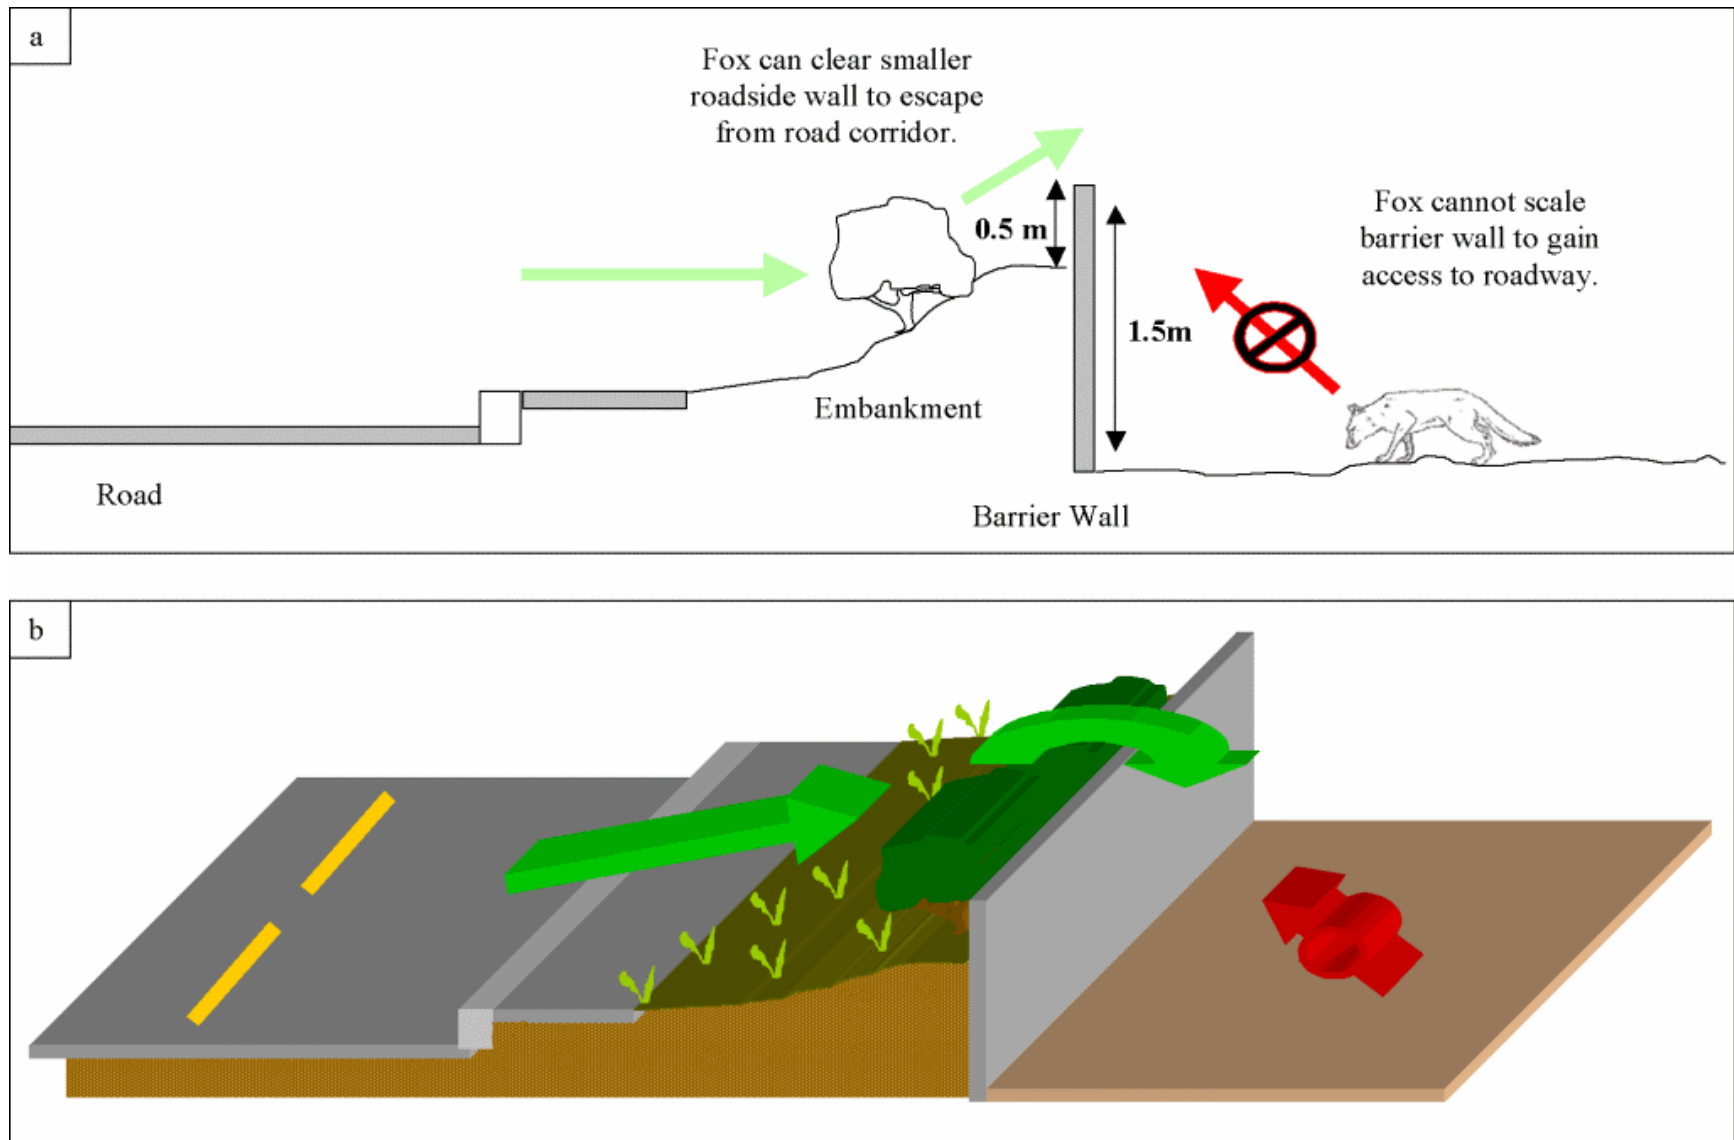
Barrier wall to encourage use of road crossing structures for the San Joaquin kit fox in urban environments. The roadside embankment allows foxes that are trapped on the roadway to clear the barrier wall. a) Cross-section view. B. Three-dimensional rendering.
